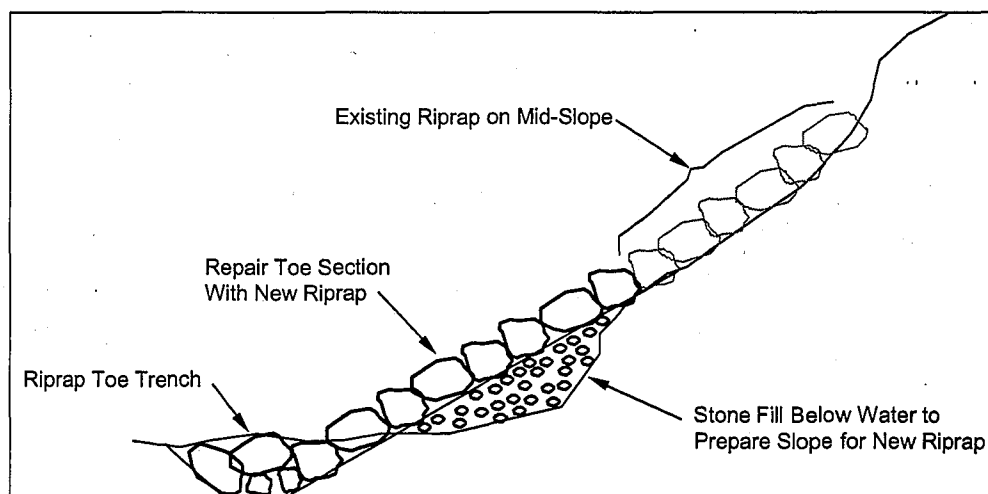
Typical cross section of riprap toe and revetment repair.
